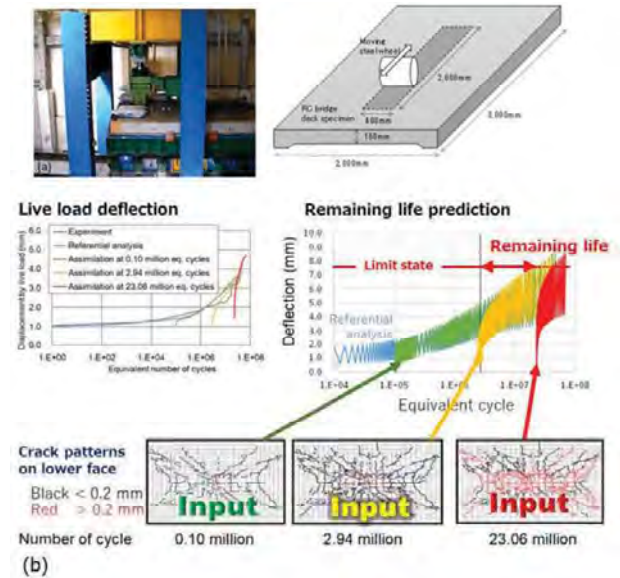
(a) wheel running test machine and dimensions of RC deck specimen and position of wheel load, (b) Data assimilation with crack patterns in wheel running test (Tanaka et al 2017).
